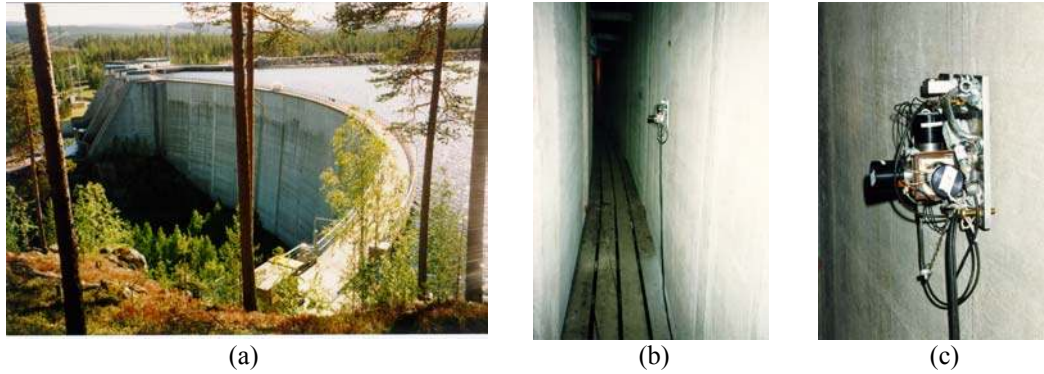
(a) Norsjö dam; (b,c) View of instrumented point at downstream side reinforced concrete wall
